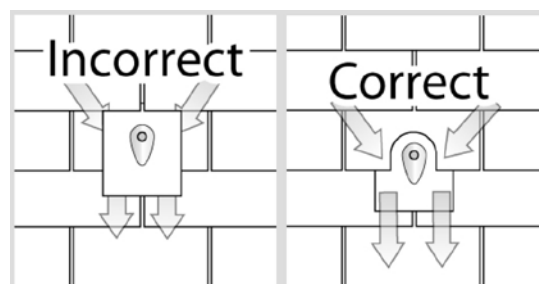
Roof boot flashing detail. (Courtesy of Professional Solar Products)
